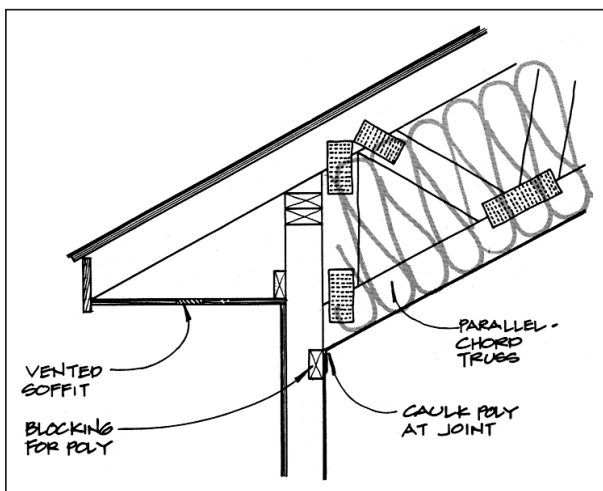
Parallel-chord trusses can butt into the exterior wall as shown, or sit atop the top plate. In either case, the top chord extends outward, providing an overhang.
